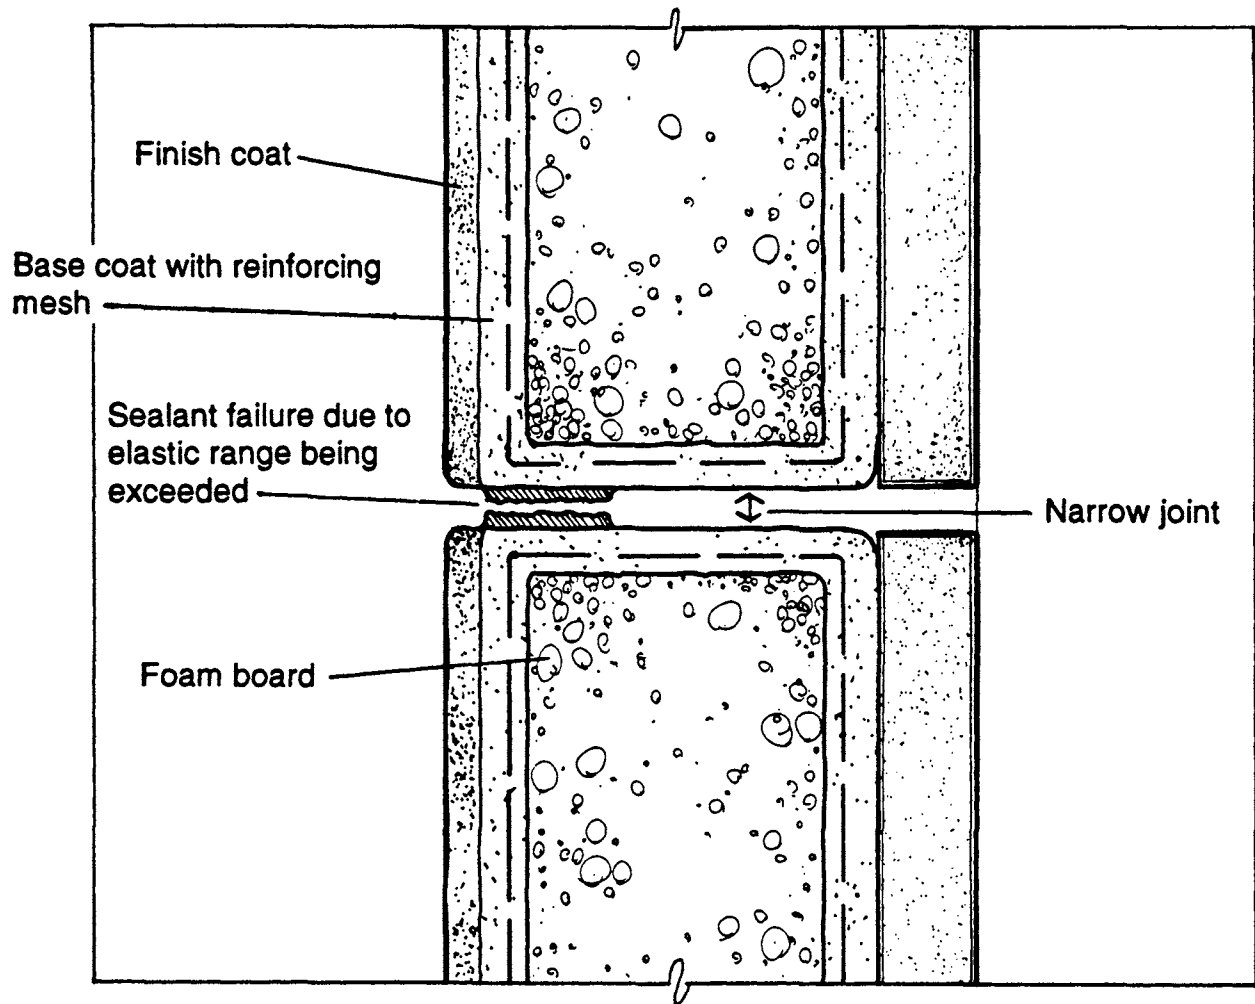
POTENTIAL JOINT FAILURE DUE TO NARROW JOINT
